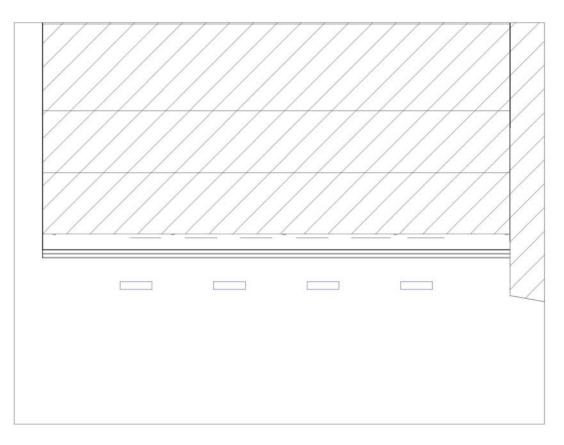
Façade Luminaire Layout – Version 2 Plan
